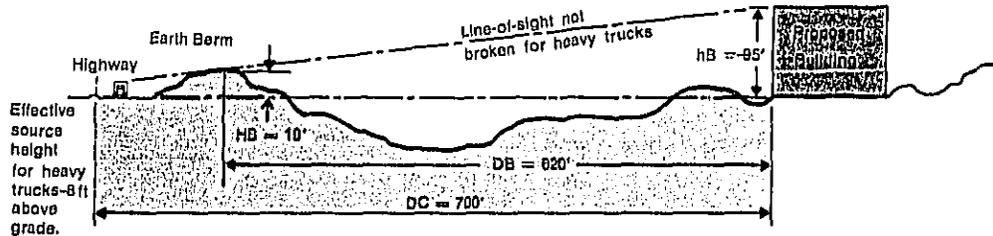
Cross-section Showing Highway #1 and Earth Berm.
